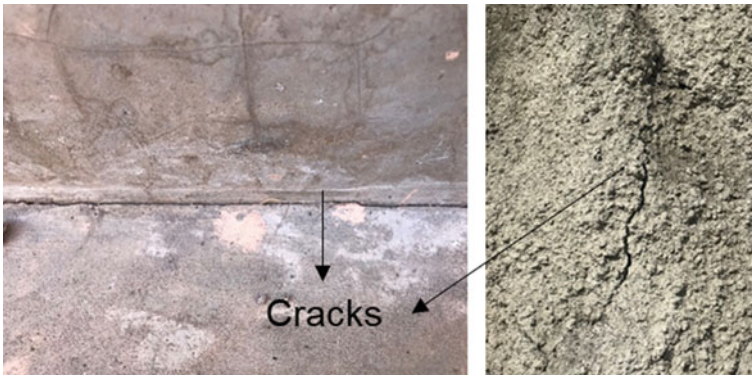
Cracks observed in the concrete intersection areas and in surface shotcrete layer
